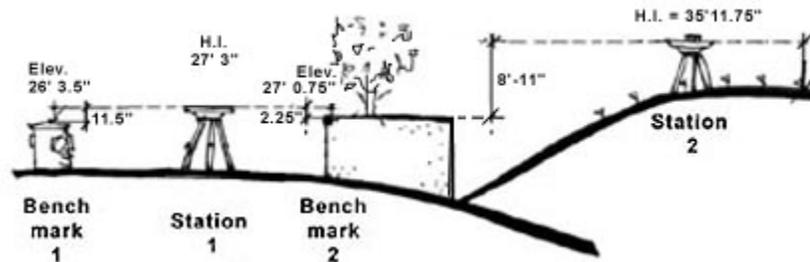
Benchmark and Station Section Diagram of plan in Fig. 10
